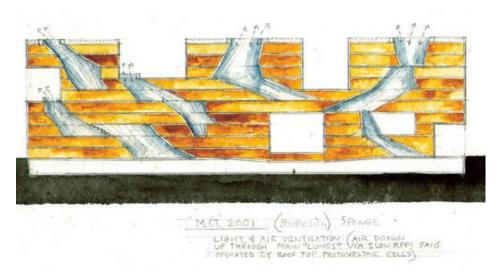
original drawing of light and air ventilation atrium (Retrieved from: https://www.architectmagazine.com/project-gallery/simmons-hall-massachusetts-institute-oftechnology)
